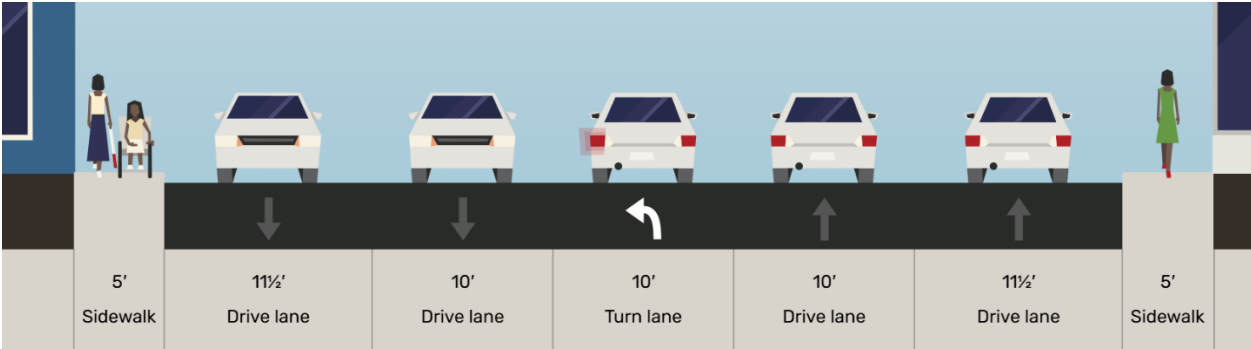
EXISTING TYPICAL SECTION (20TH ST TO ELYRIA AVE)
